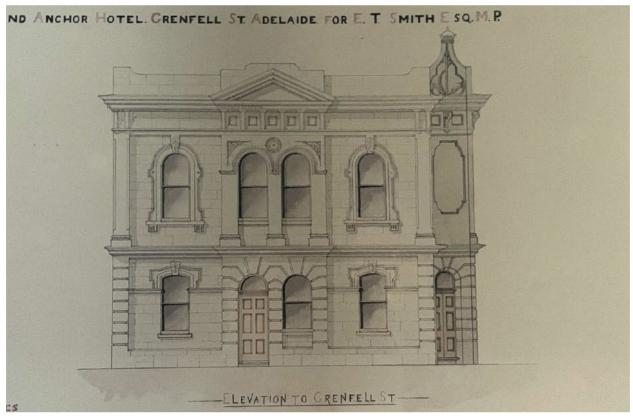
South Elevation, Part Crown and Anchor Hotel Contract Drawing, 1879 Source: State Library of South Australia, B 58651
